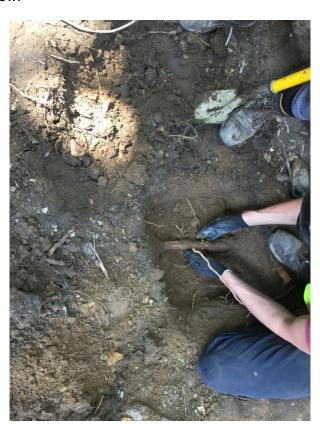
hand excavation to retain tree roots: Careful hand excavation or the use of compressed air or vacuum excavation can be used to retain tree roots larger than 25mm diameter
